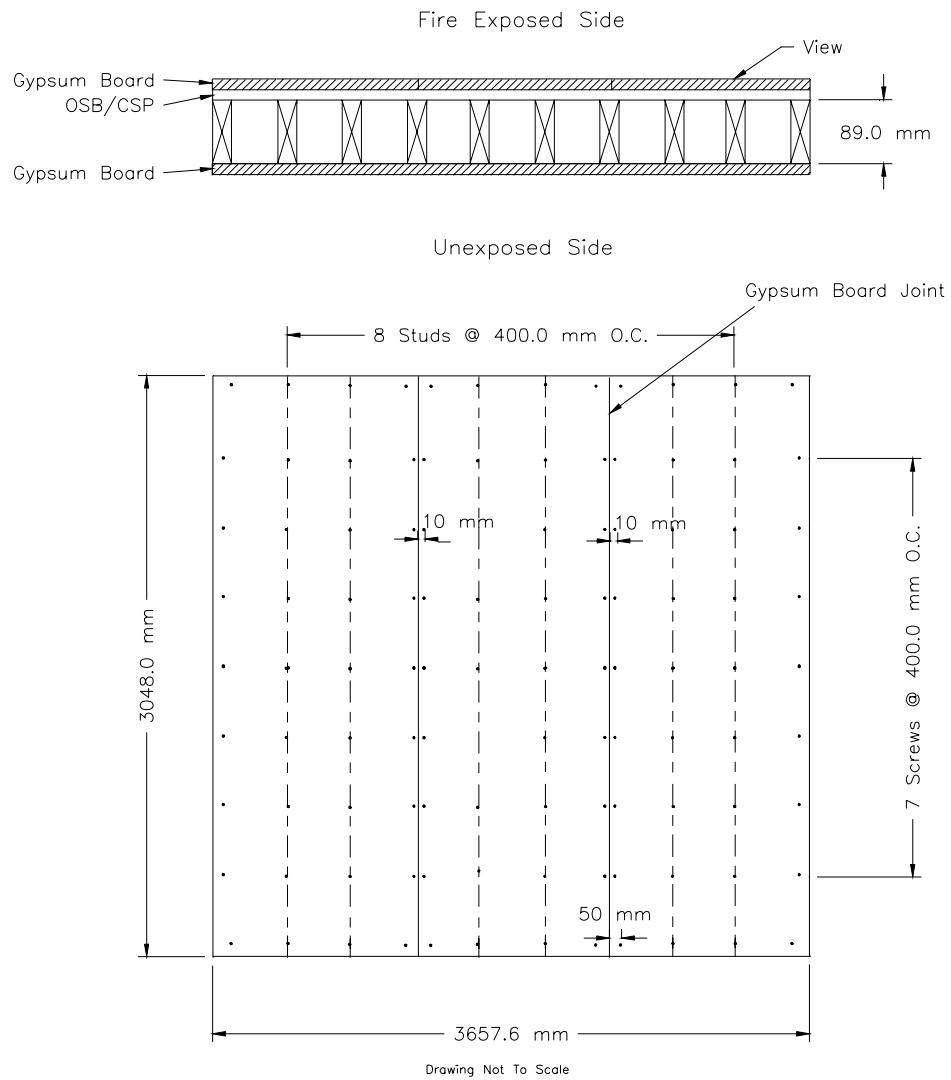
Screw Locations for Wood Stud Wall Assemblies, 2x1 Face Layer Unexposed Side (F19 and F20)
